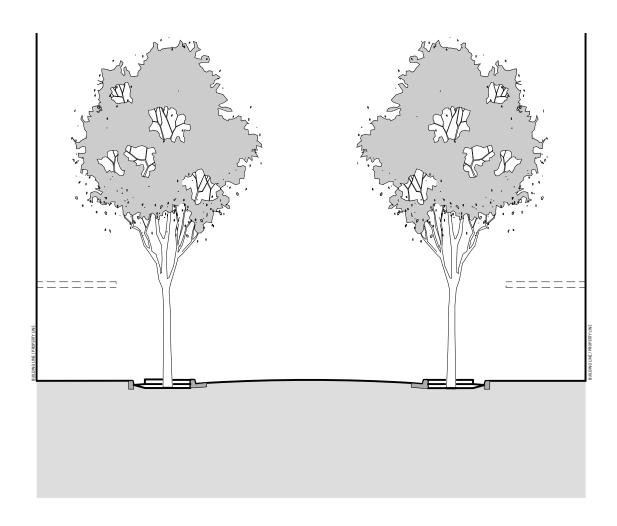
Street Tree Typical WSUD Pit Location in Footpath > 4000
